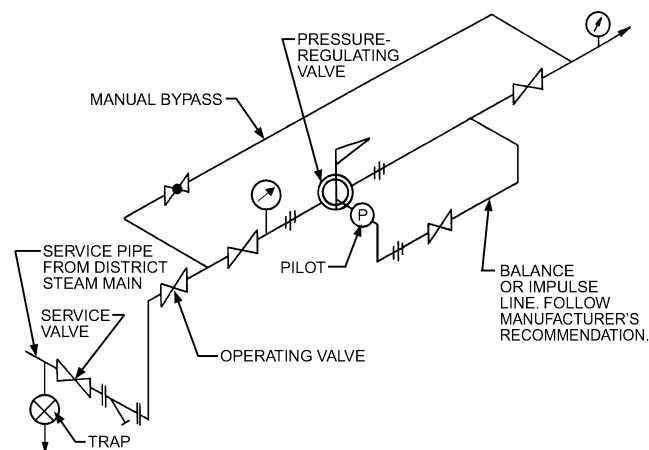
Pressure-Reducing Valve Connections—Low Pressure
